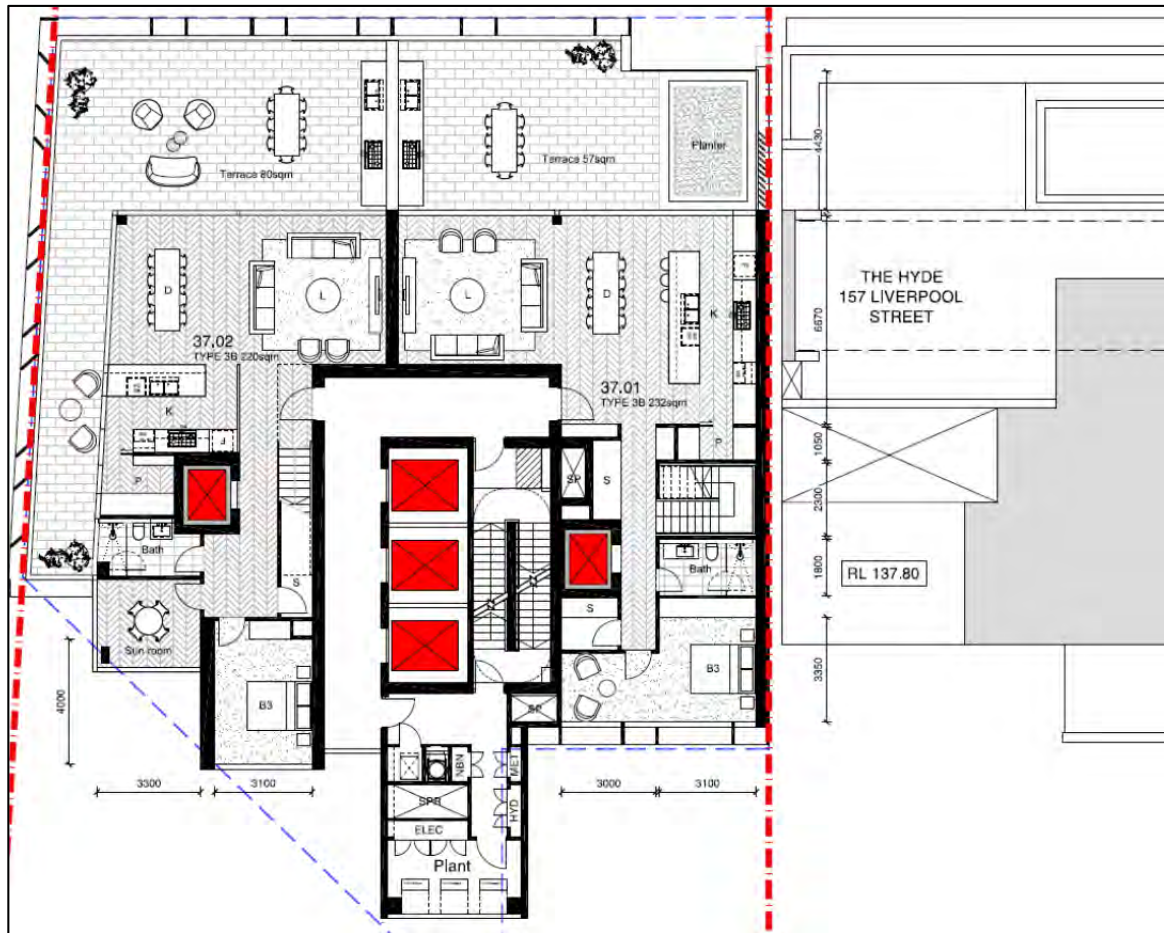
The proposed floor plan and roof top terraces of the penthouse apartments on Level 37 of the subject development
